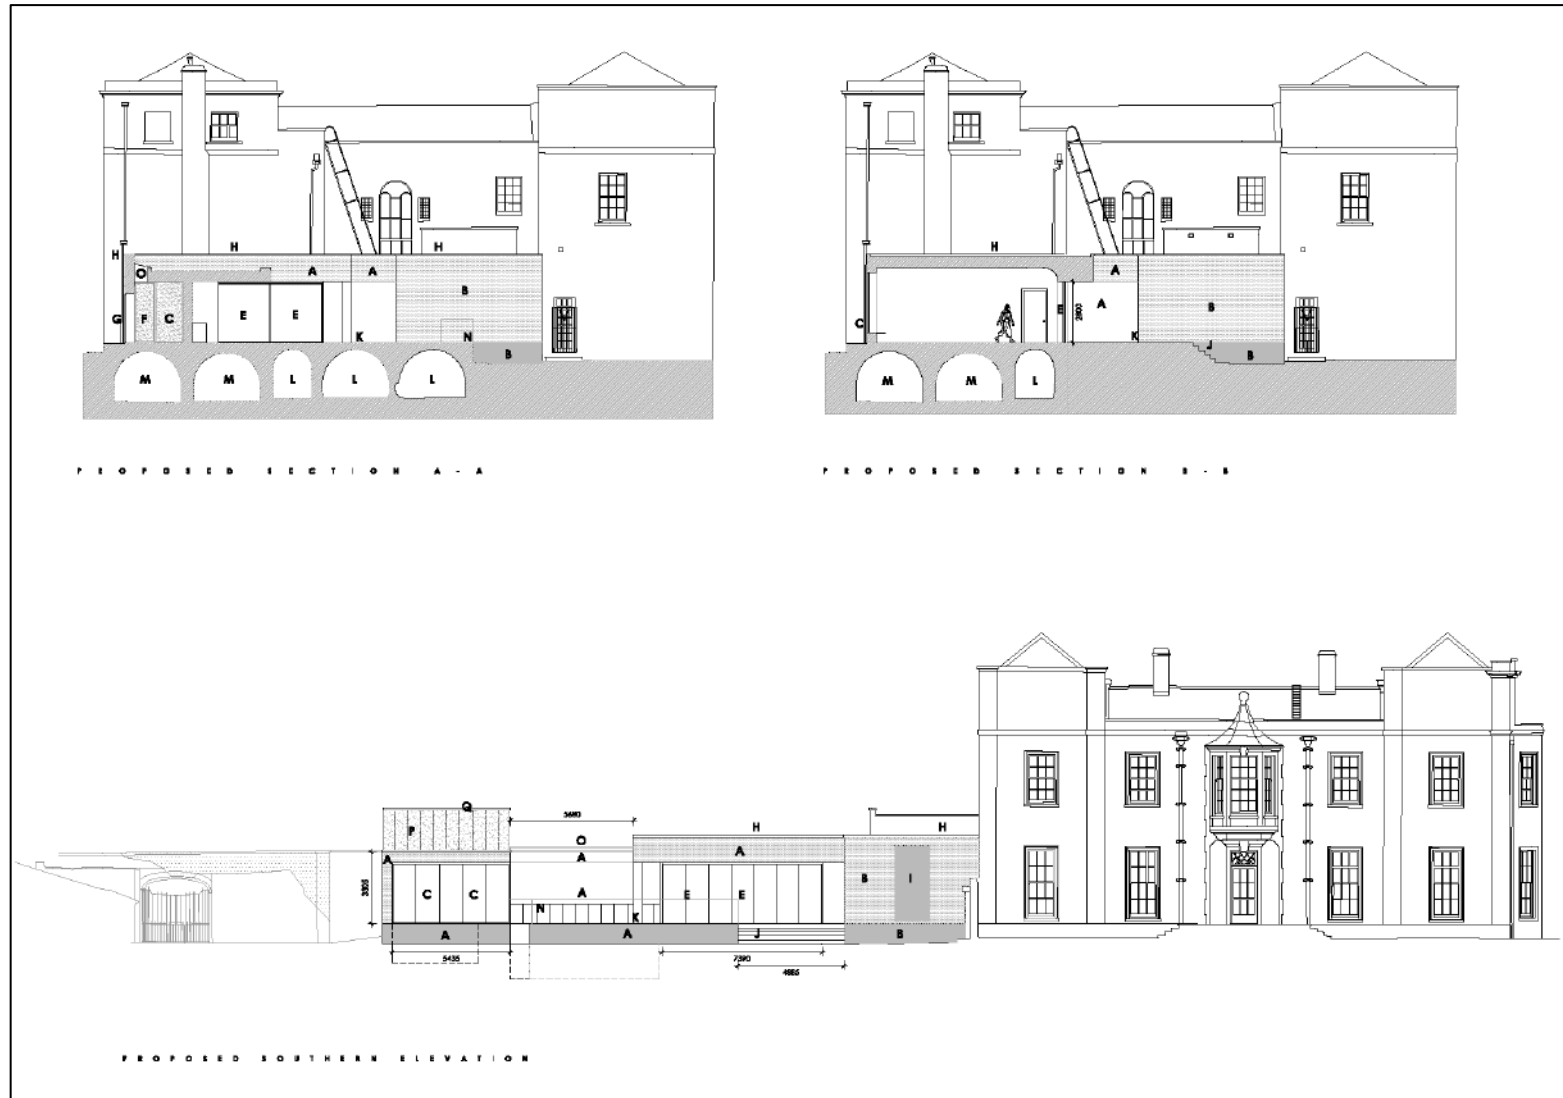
Proposed Option 2 sections and west elevation (Jonathan Hendry Architects).
